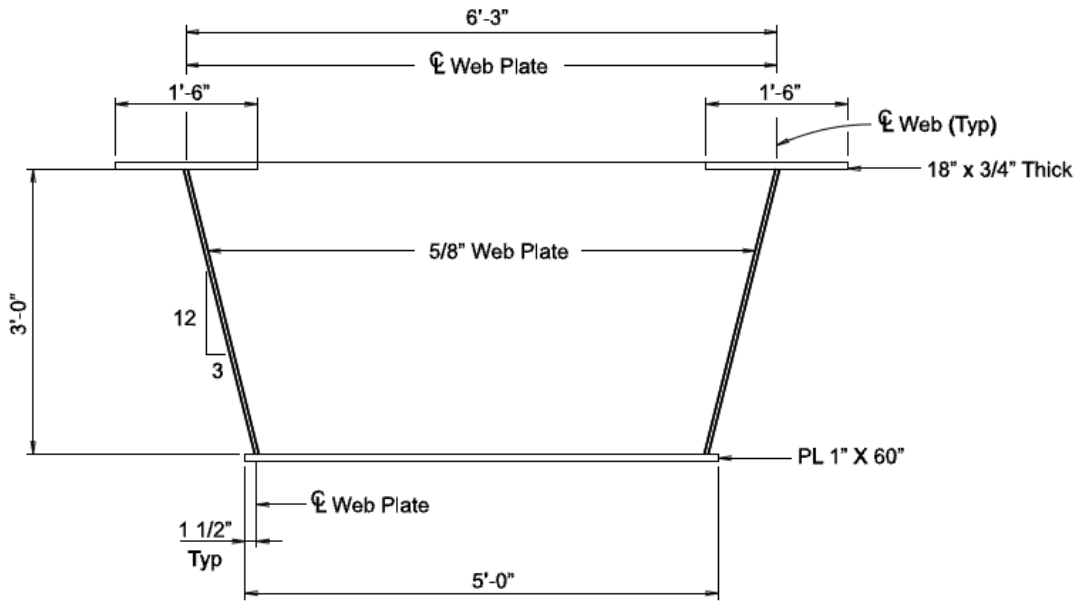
TxDOT Tub Girder for Rapid Bridge Replacement (Chandar et. al., 2010)
